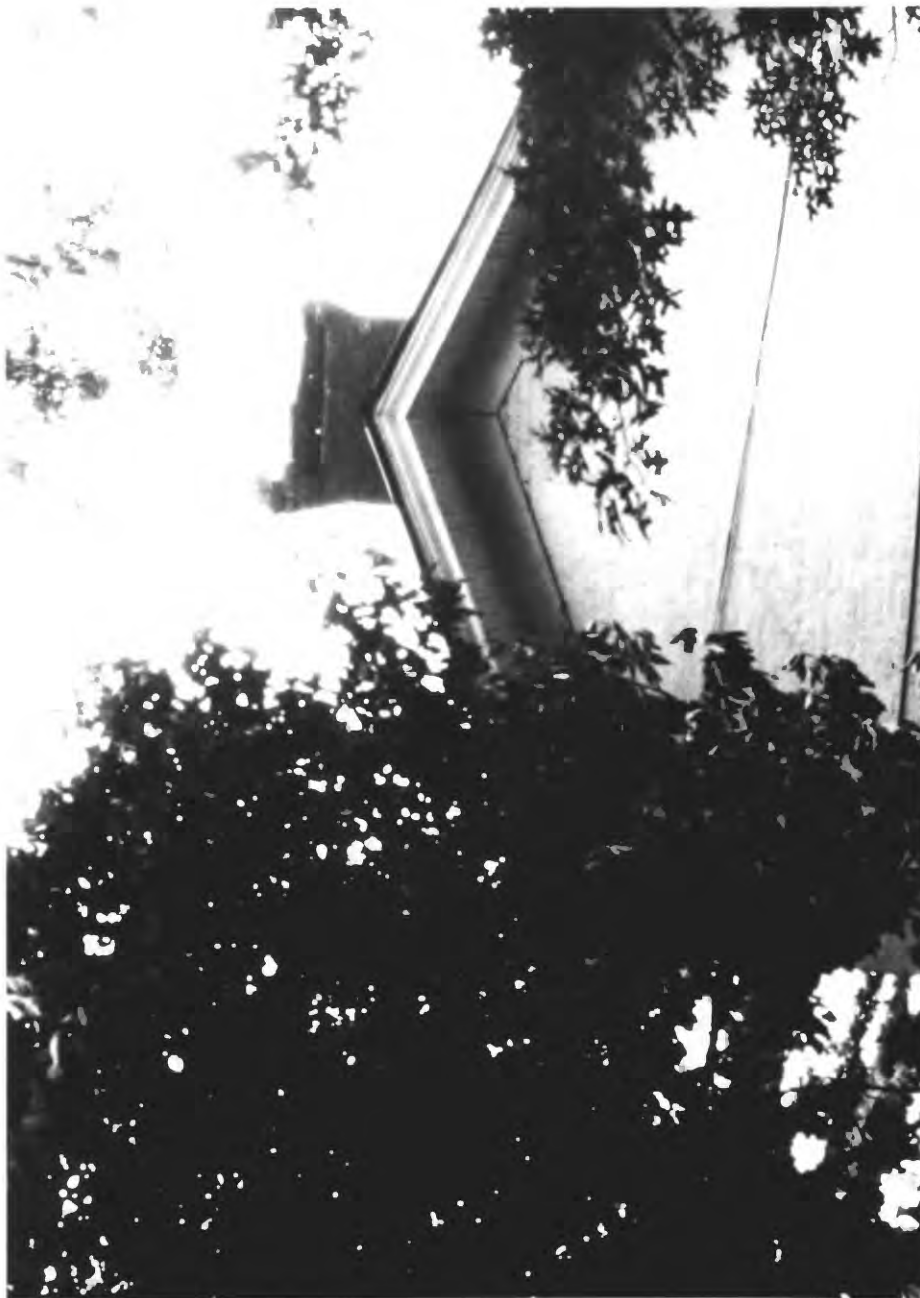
Bricks knocked out of chimney top on 2nd Street one block west of Market in Aberdeen, Ohio.
